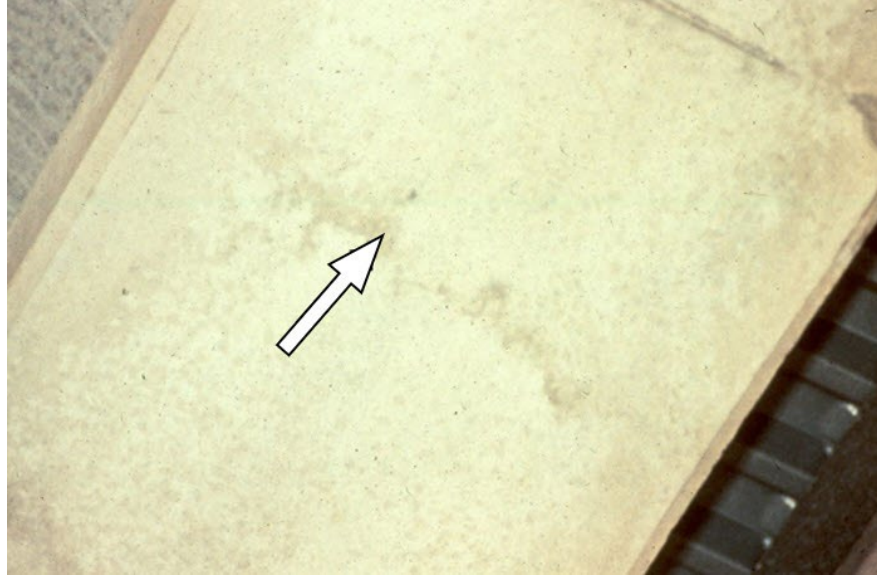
Flexure Crack on Bottom Flange of Prestressed Box Beam
